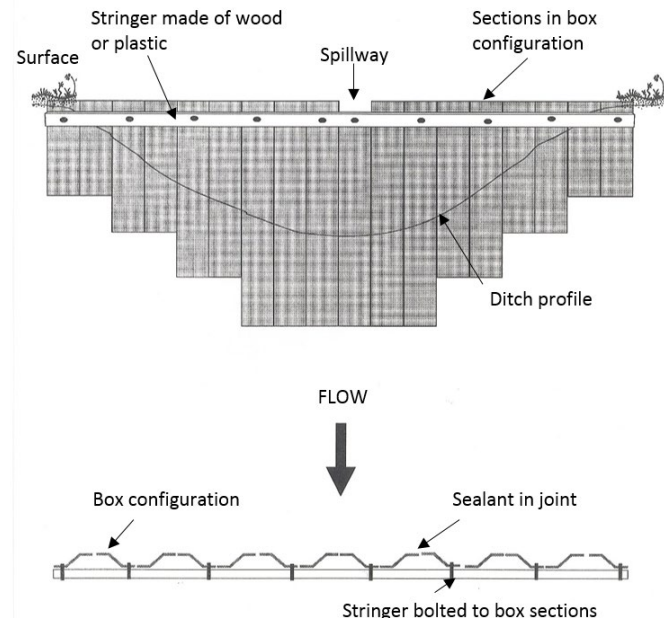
A long plastic piling dam constructed in box configuration can be strengthened using stringers and made watertight by inserting sealant or hydroseal into the gaps.
